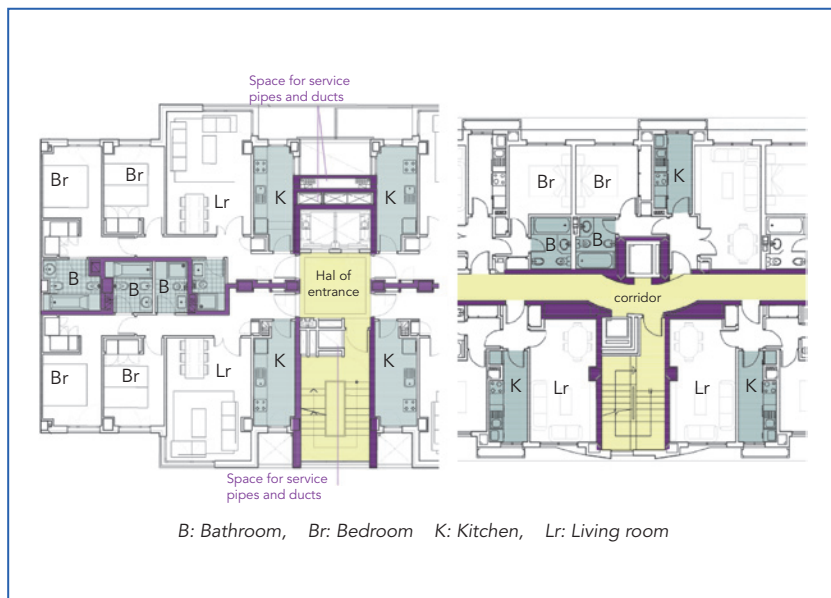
Examples of acoustic favourable / unfavourable layout in buildings.
